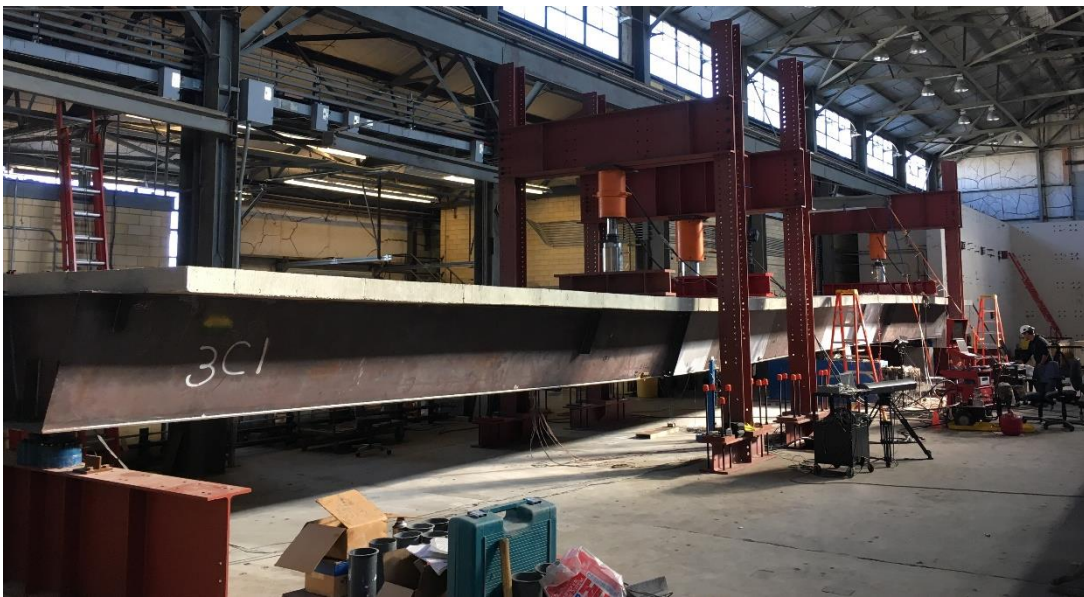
Continuous Girder Test Setup - Tub #3 (During Test)
